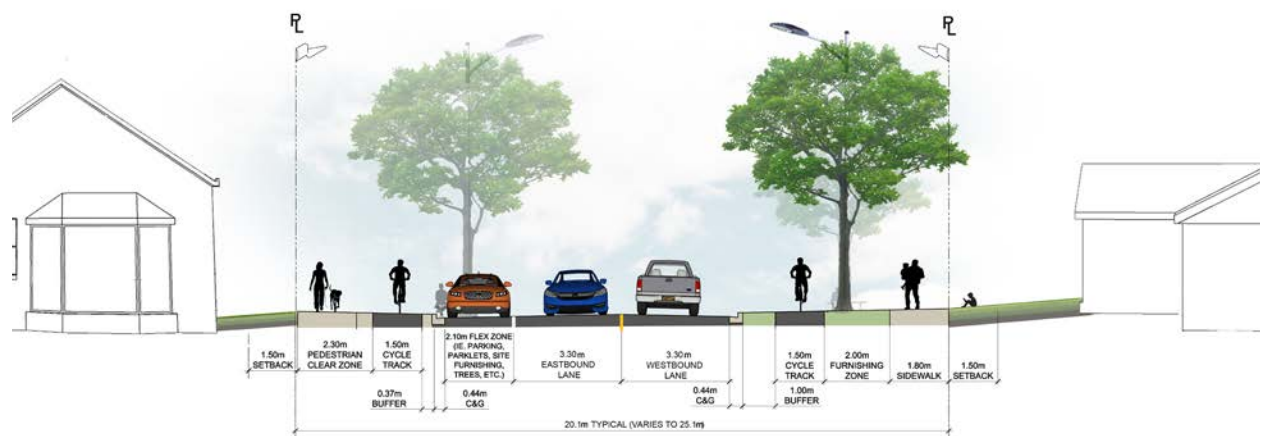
THE EAST END TYPICAL SECTION - INTERIM
